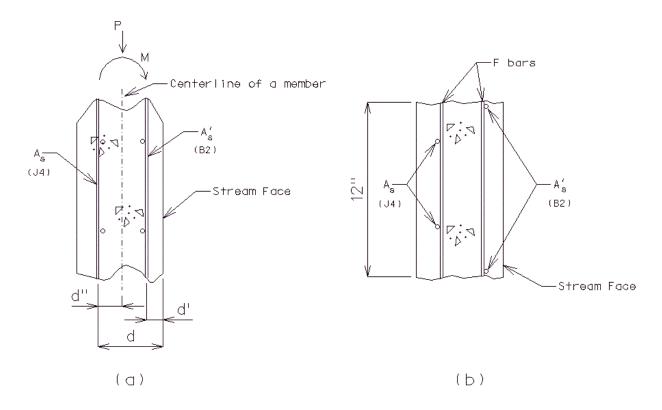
Details of steel reinforcement of Member #1 at Section A-A (Figure 3.20.2.6-1) (a) partial elevation view (b) partial plan view
